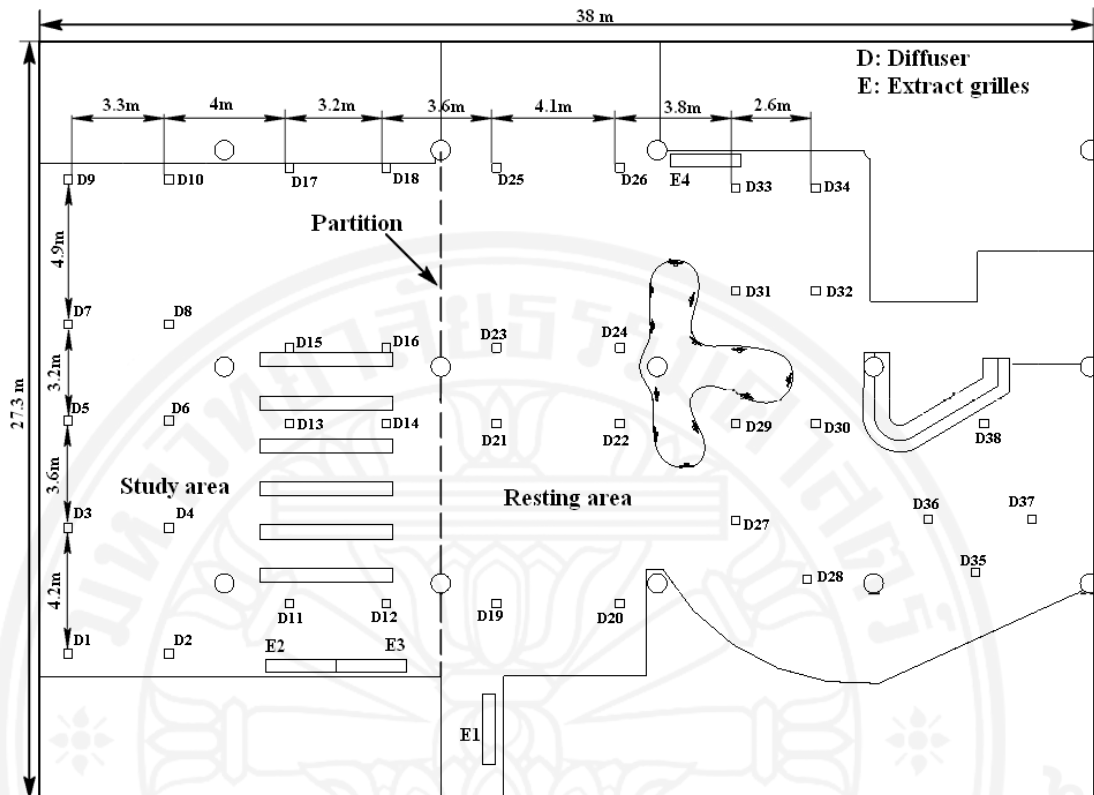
Location of supply diffusers (D1-D38) and extract grilles (E1-E4)
